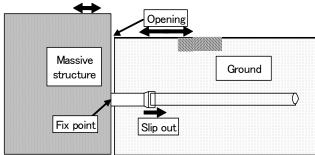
Pipe Joint Slippage at Structure Connection
